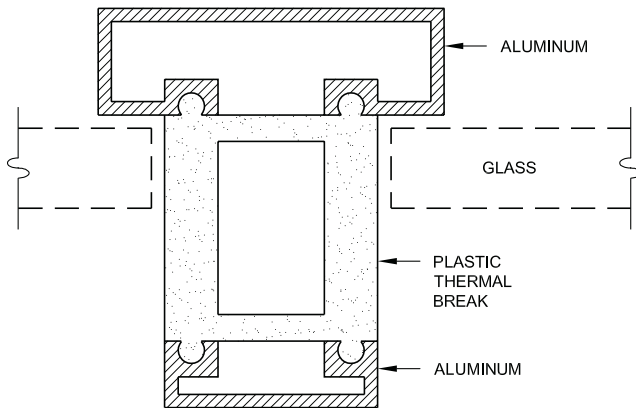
Curtain wall systems should have thermal breaks to prevent heat bridges. A detail of a schematic mullion is shown.
